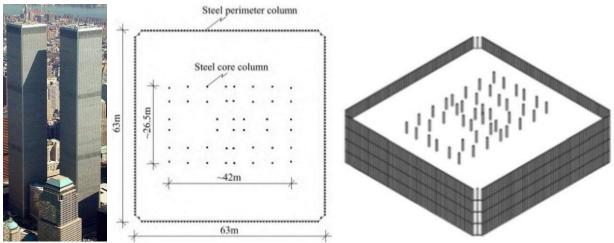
The World Trade Center Twin Towers' Columns were 0.65 meters (2.1 feet) apart
